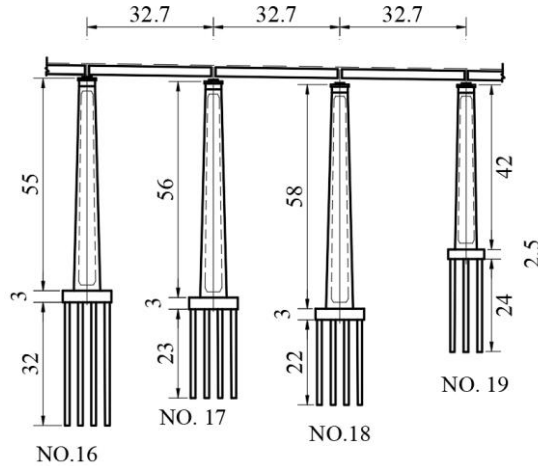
Facade Layout of a High Pier Bridge on a Railway.
